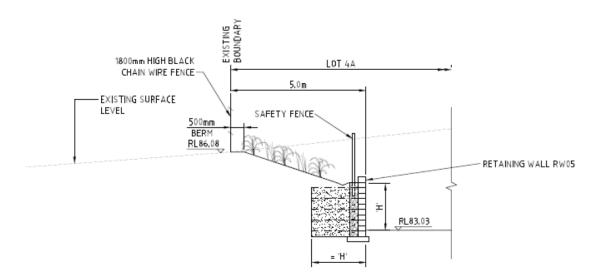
Typical Section through Retaining Wall – Southern Boundary
